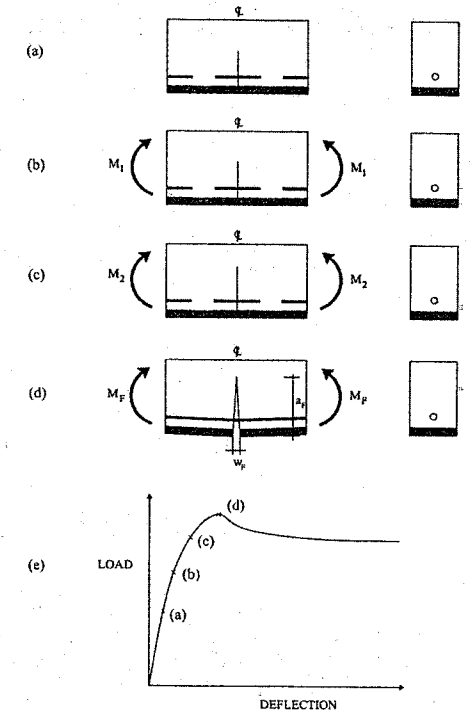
Sequence of crack growth in the middle part of the beams retrofitted with one strip: (a) existing crack in the pre-damaged beam, (b) reopening of the existing crack in the pre-damaged beam, (c) propagation and penetration of the dominant crack into the tension strip, (d) opening of the dominant crack, and (e) load levels corresponding to the observed crack growth sequence.
